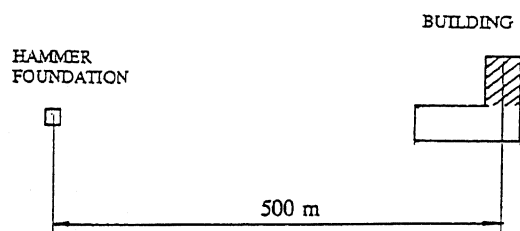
Layout of apartment building and vibration isolated foundation under large forge hammer
